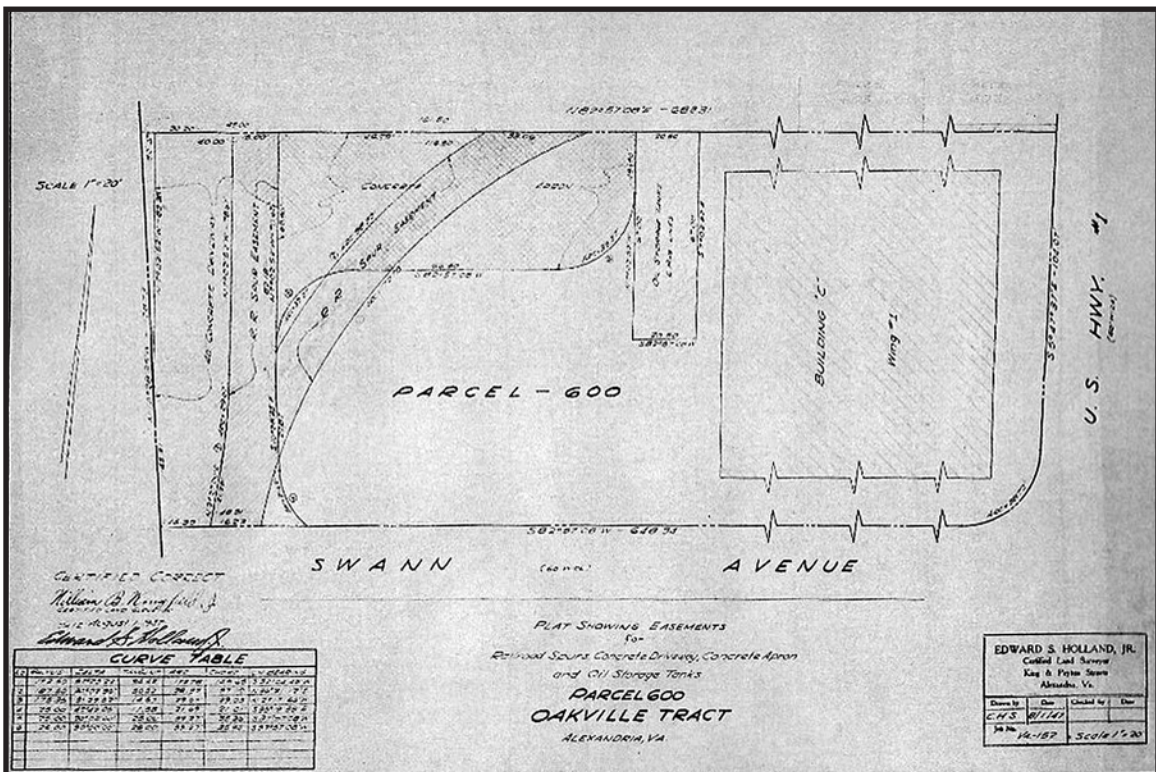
Edward Holland (1947) Plat Showing Easement for Railroad Spurs, Concrete Driveway, Concrete Apron, and Oil Storage Tanks, Parcel 600, Oakville Tract.
